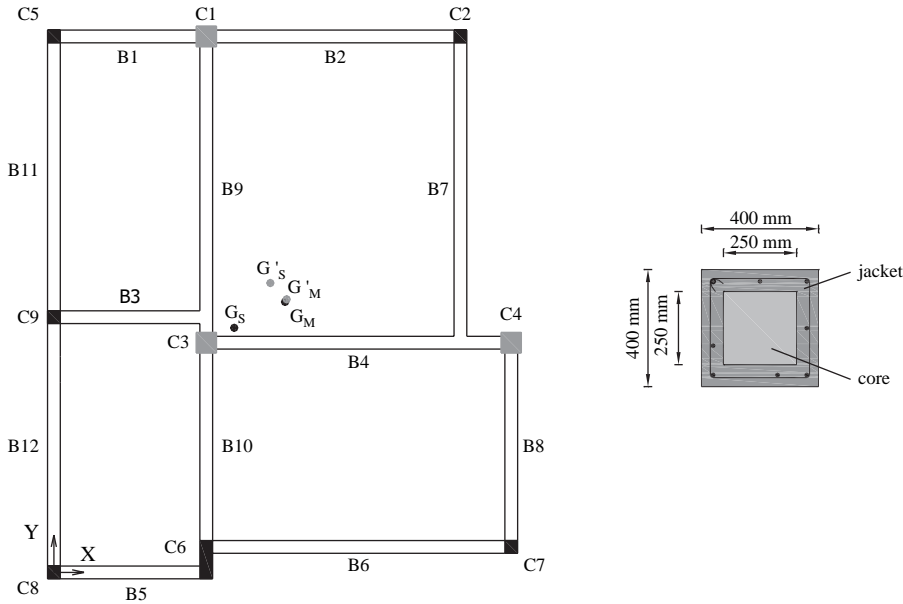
Centers of masses and strengths, for both original and retrofitted by RC jackets structure (left); cross section of a jacketed column (right).
